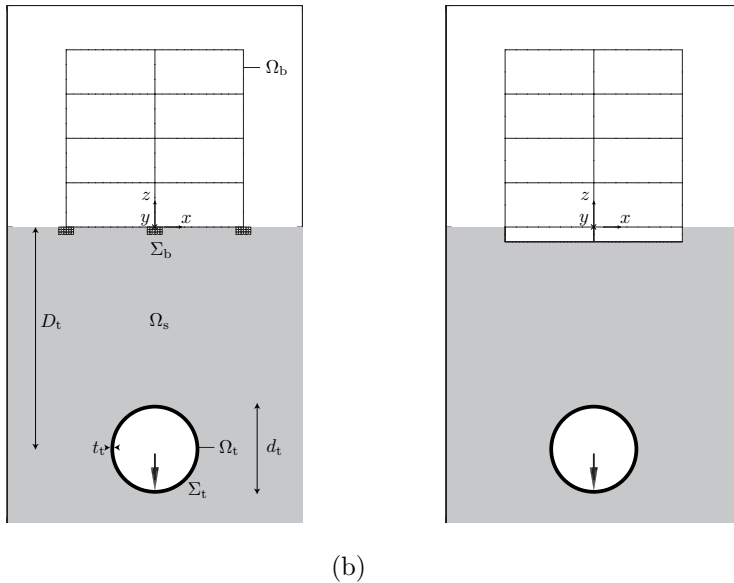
Railway tunnel  $\Omega_t$  situated at a depth  $D_t$  below a four storey portal frame  $\Omega_b$  founded (a) on three embedded strip foundations and (b) on a box foundation. A unit harmonic vertical point load is applied to the tunnel invert at  $\mathbf{x} = \{0 \text{ m}, 0 \text{ m}, -D_t - d_t/2 + t_t\}^T$ .
